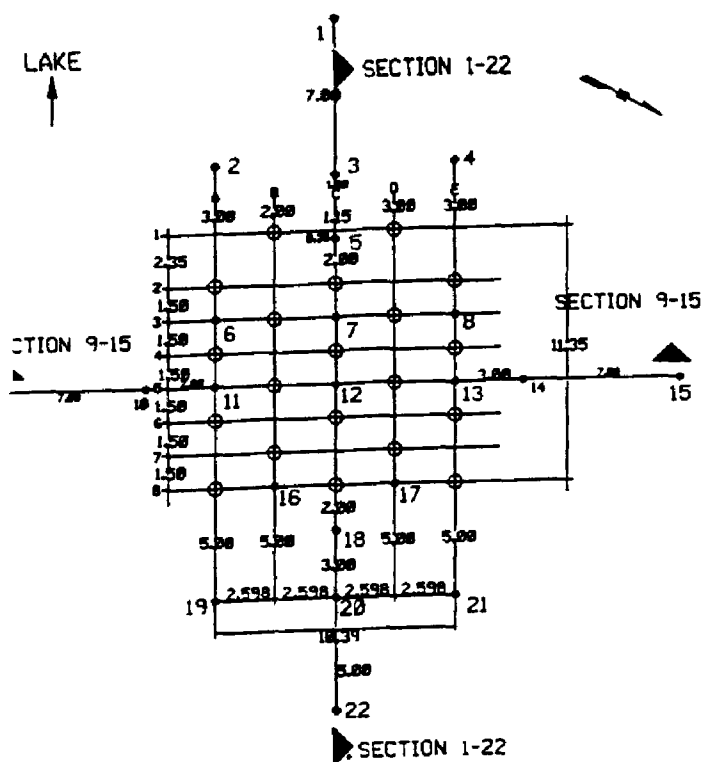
LOCATION OF OBJECT POINTS 1 TO 22
